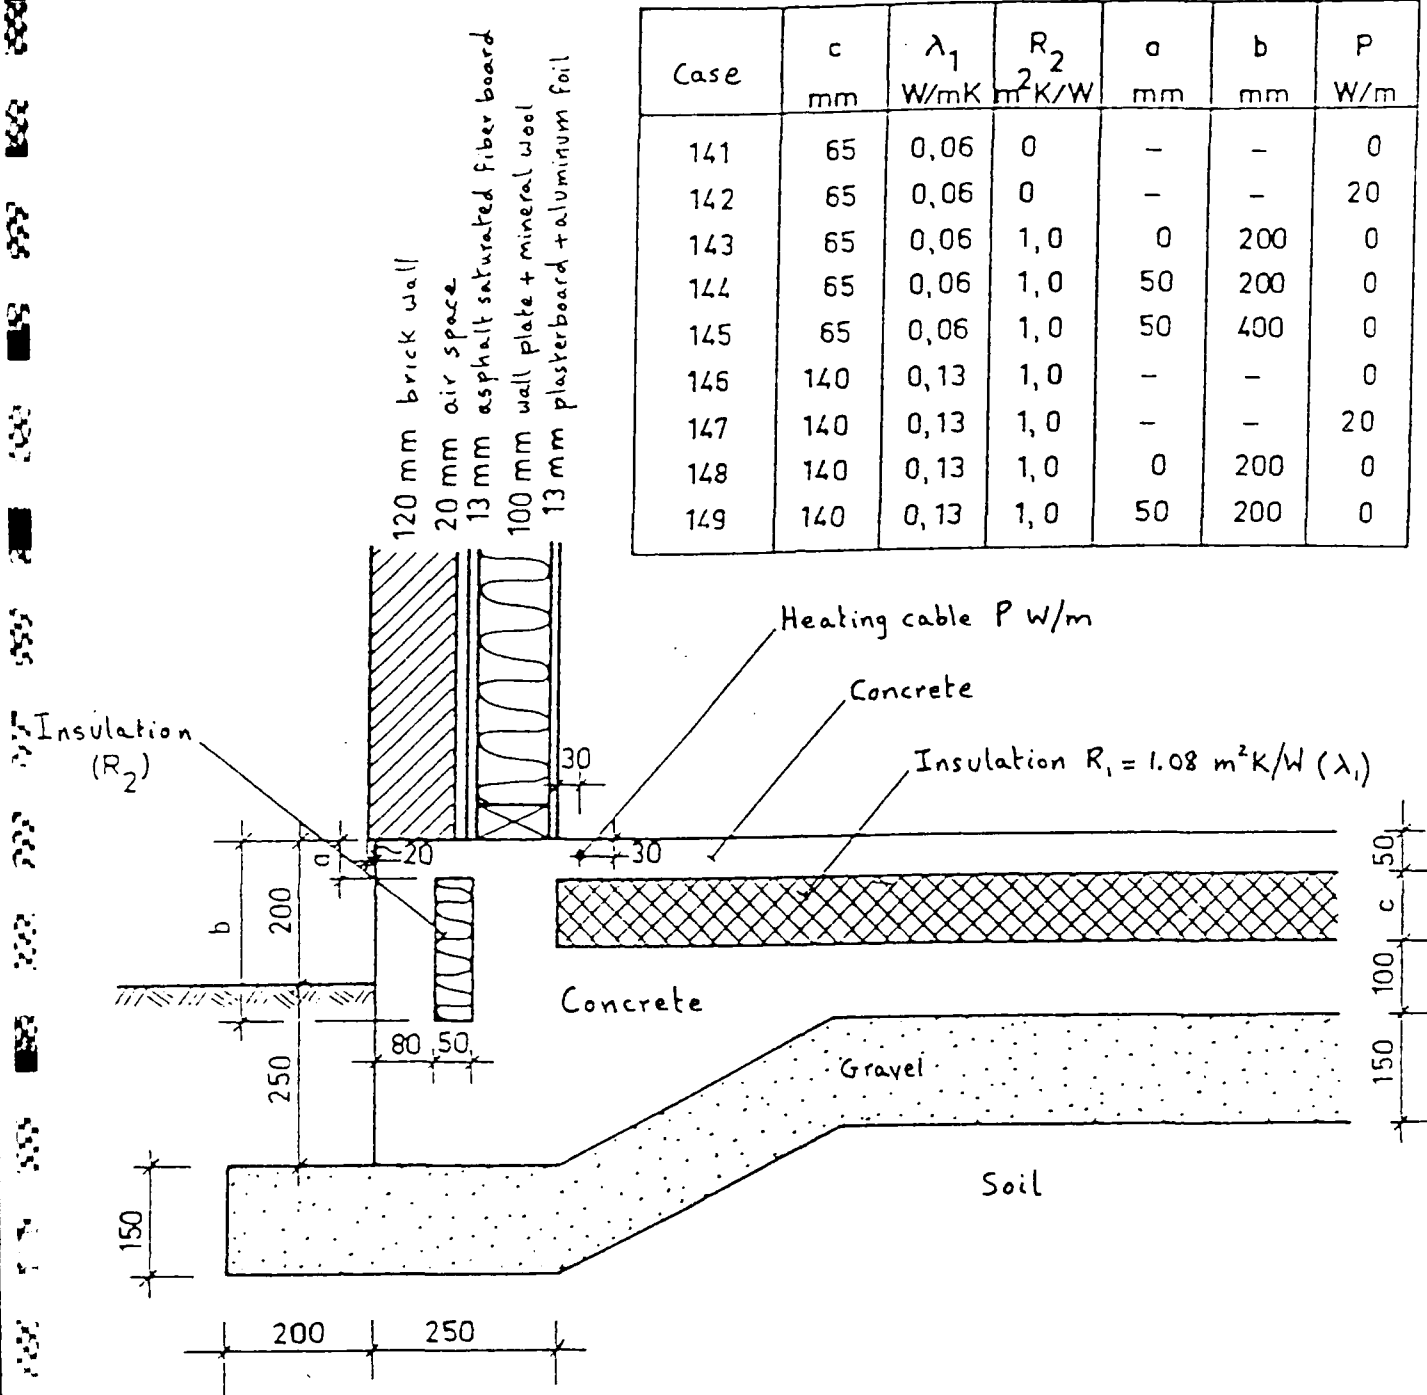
Edge-stiffened concrete slab with insulation on top of slab
